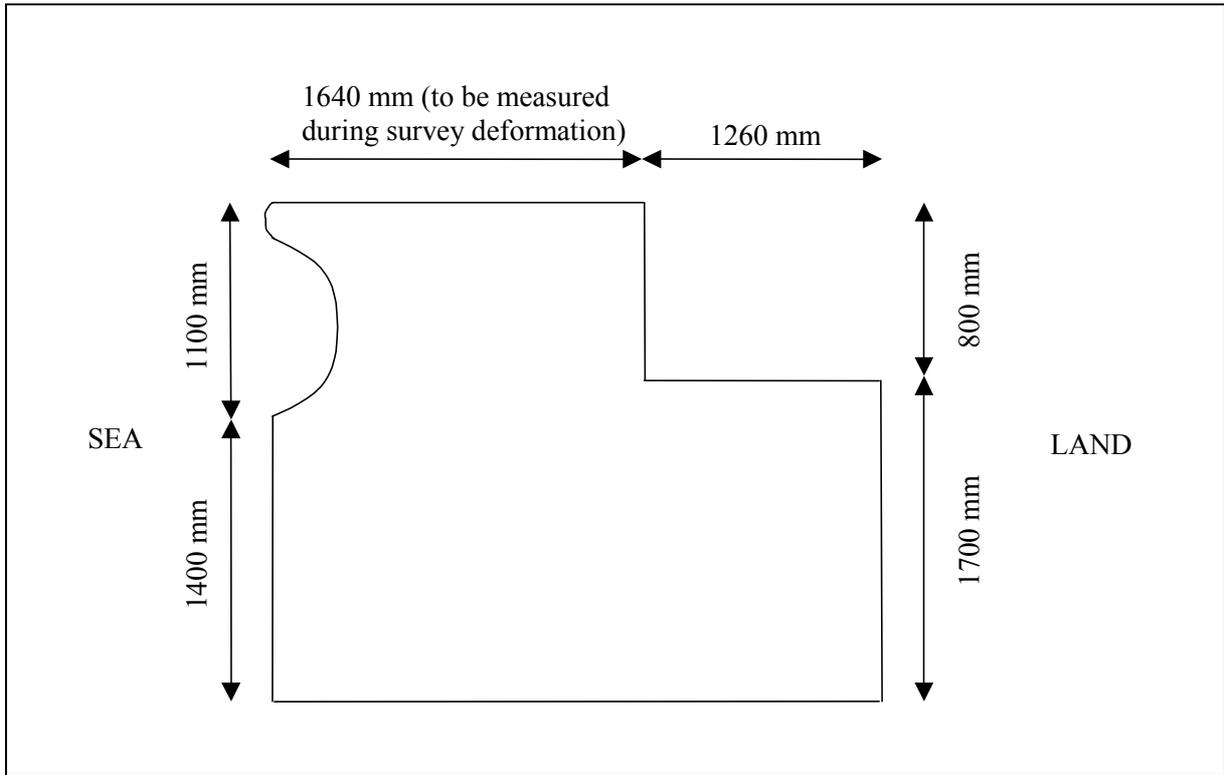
Typical Section of a Seawall Block (provided by Consultants)
